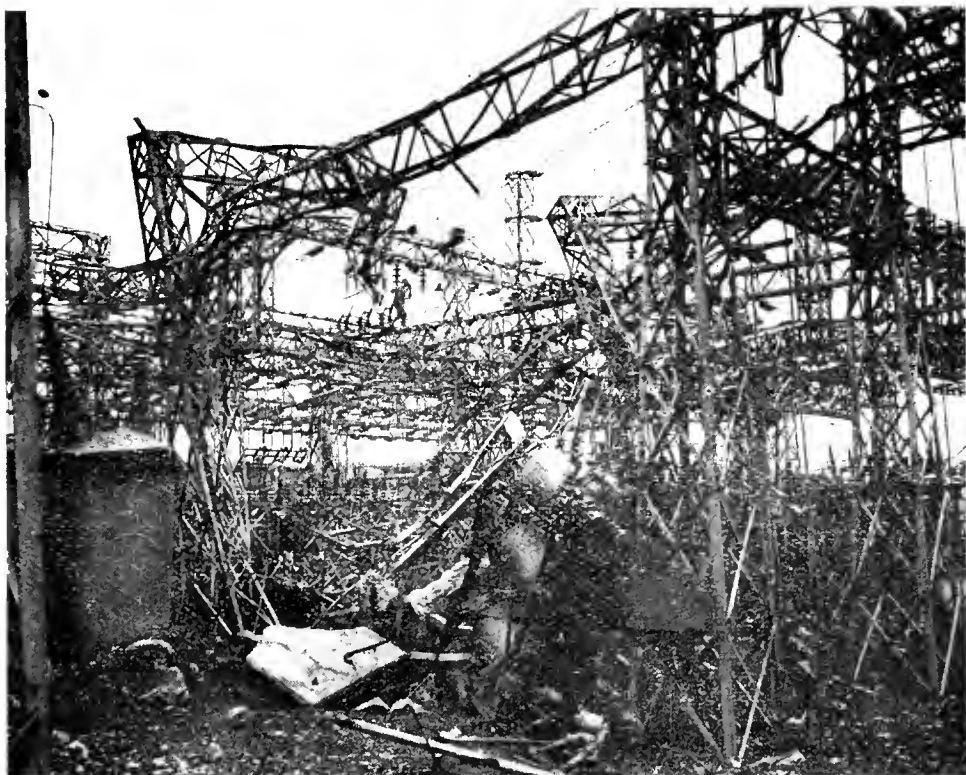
Destroyed O.C.B. and other damage to switch yard—Raid number 2
